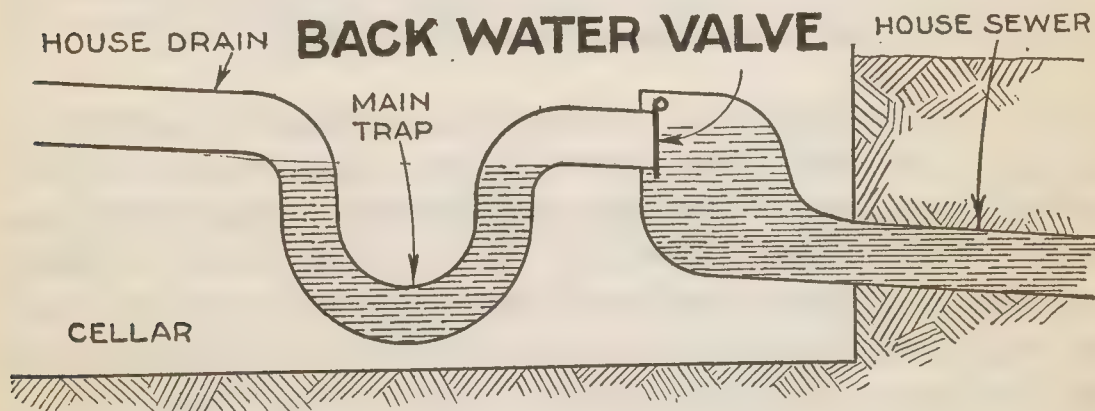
,650.—Back water valve used to prevent back flow of water from street sewer into house drain in time of heavy rain fall or high tide. *This valve should never be used if it can possibly be avoided.
